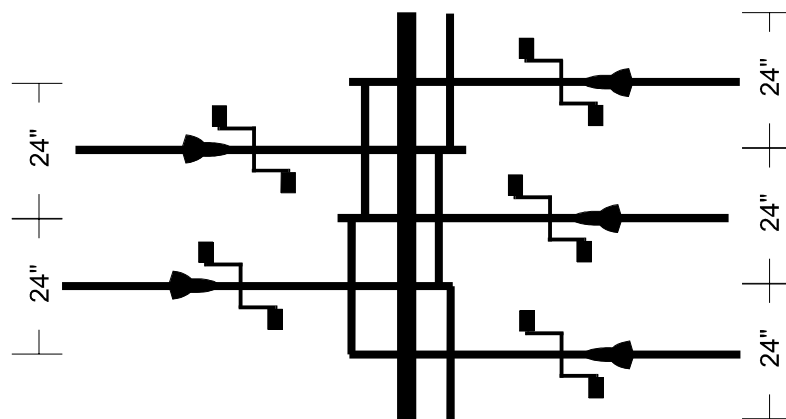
Double-sided rack, handlebars do not overlap the rack. Five bikes can be parked in the width of three, provided the location has adequate length (20 feet total: 10 feet for bicycles, assuming 1 foot of overlap, plus two 5-foot access aisles, one behind each row of bicycles).
